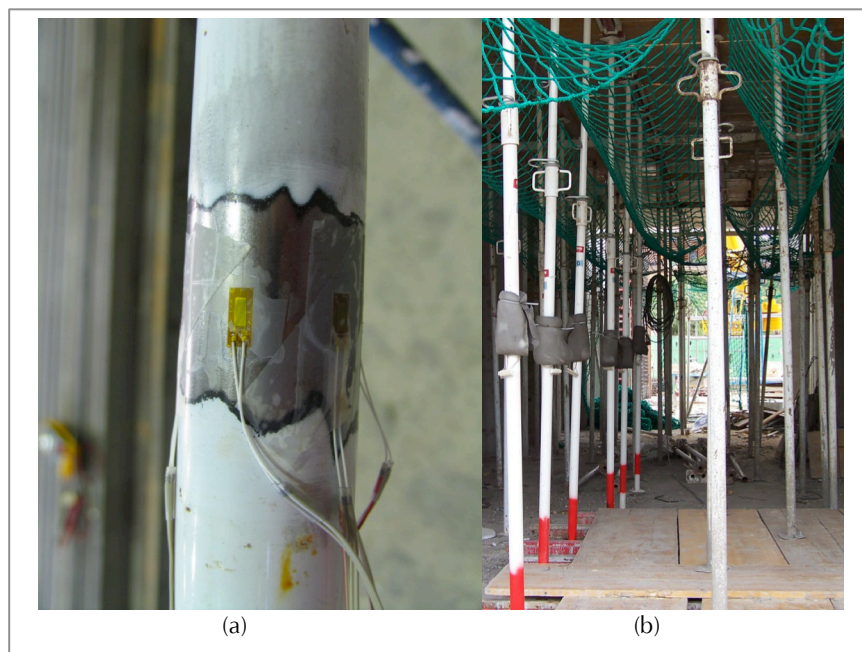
(a) Instrumented shore (b) Set of shores instrumented on site.
